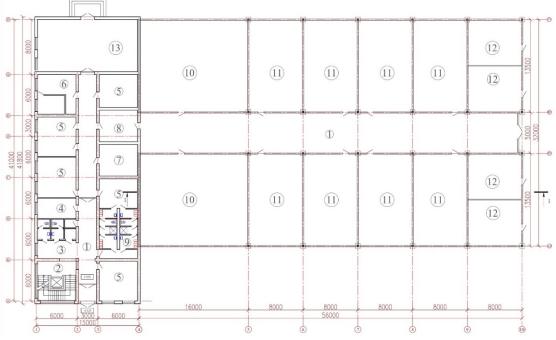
Plan of the first floor of the phytotron-greenhouse complex:
